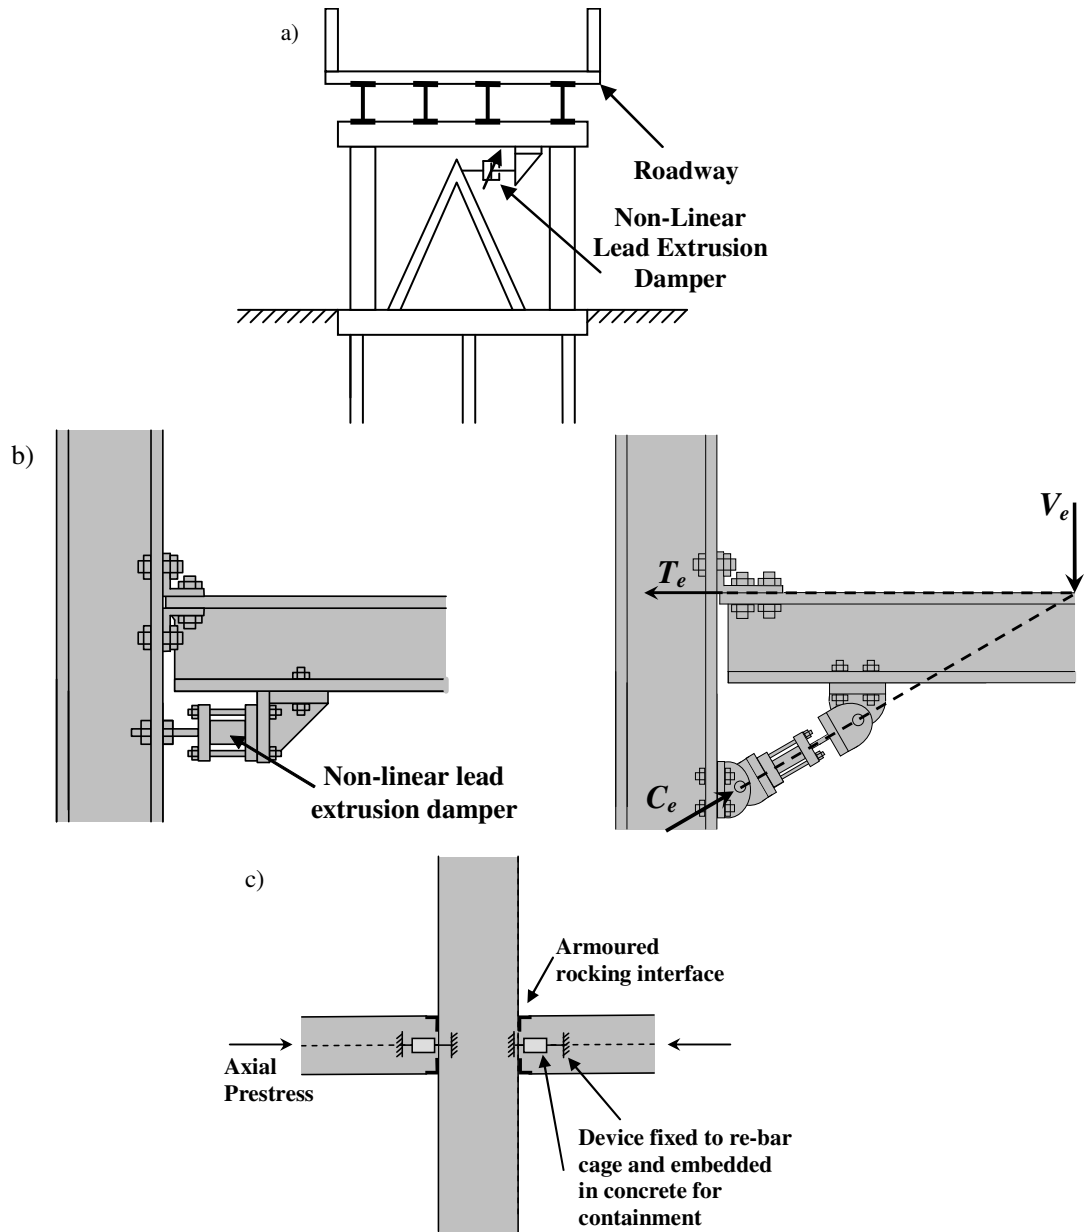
Possible applications for lead extrusions dampers; a) in a bridge pier, b) a seismic moment-frame steel beam-column connection, and a seismic load-balancing frame system, and c) in a reinforced concrete joint utilising Damage Avoidance Design (DAD)
